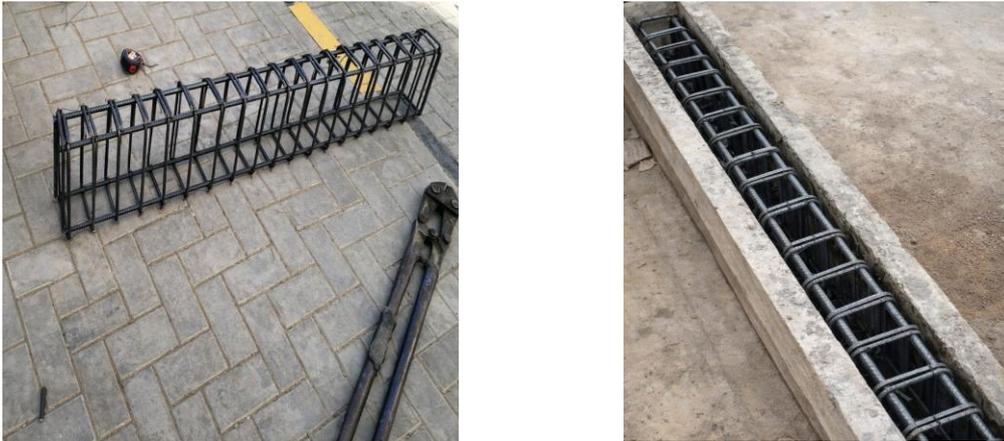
Reinforcement cage of the reinforced concrete beam, Steel reinforcement cages inside the wooden form work
